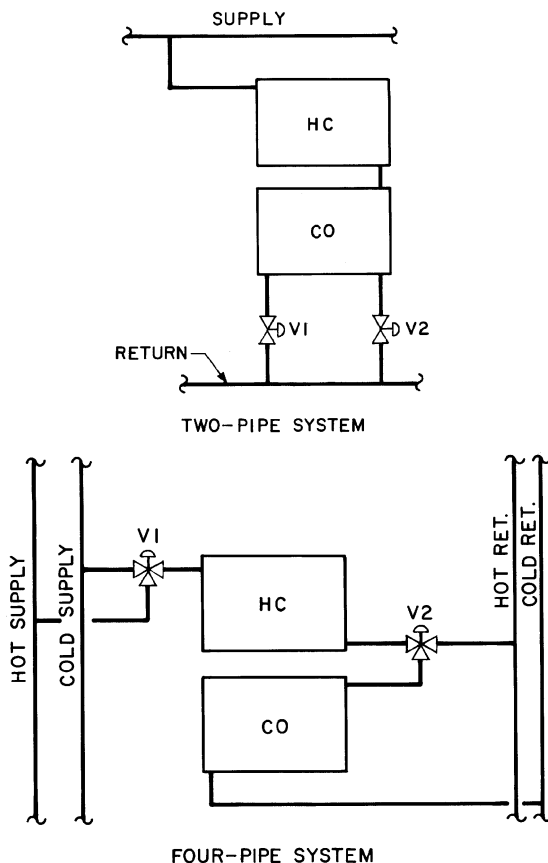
Split Panel Piping Arrangement for Two-Pipe and Four-Pipe Systems
